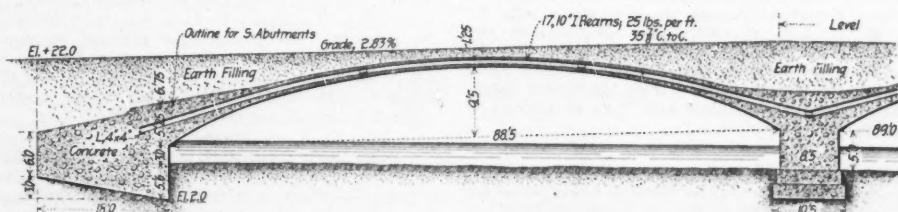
LONGITUDINAL SECTION OF 88.5-FT. MELAN ARCH BRIDGE FOR WEST ST. BRIDGE, PATERSON, N. J.
